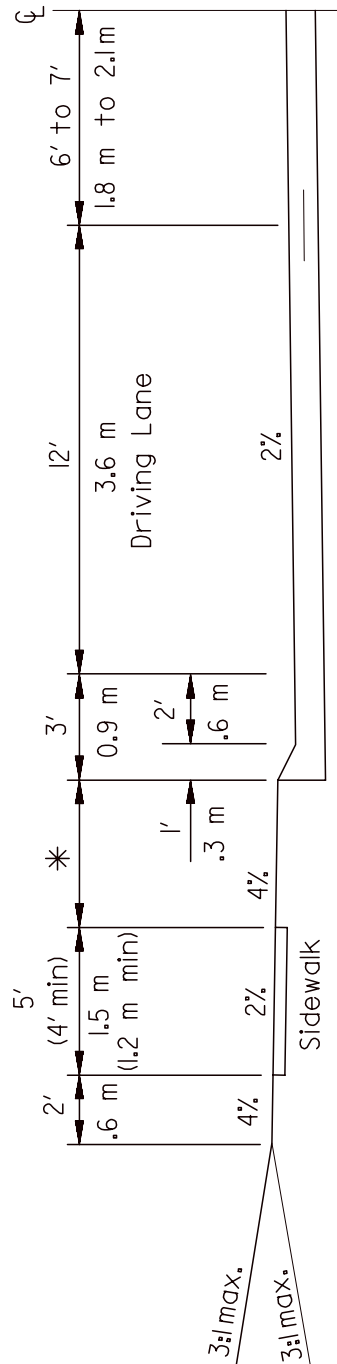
Urban Typical Cross-Sections: 2-Lane Undivided
